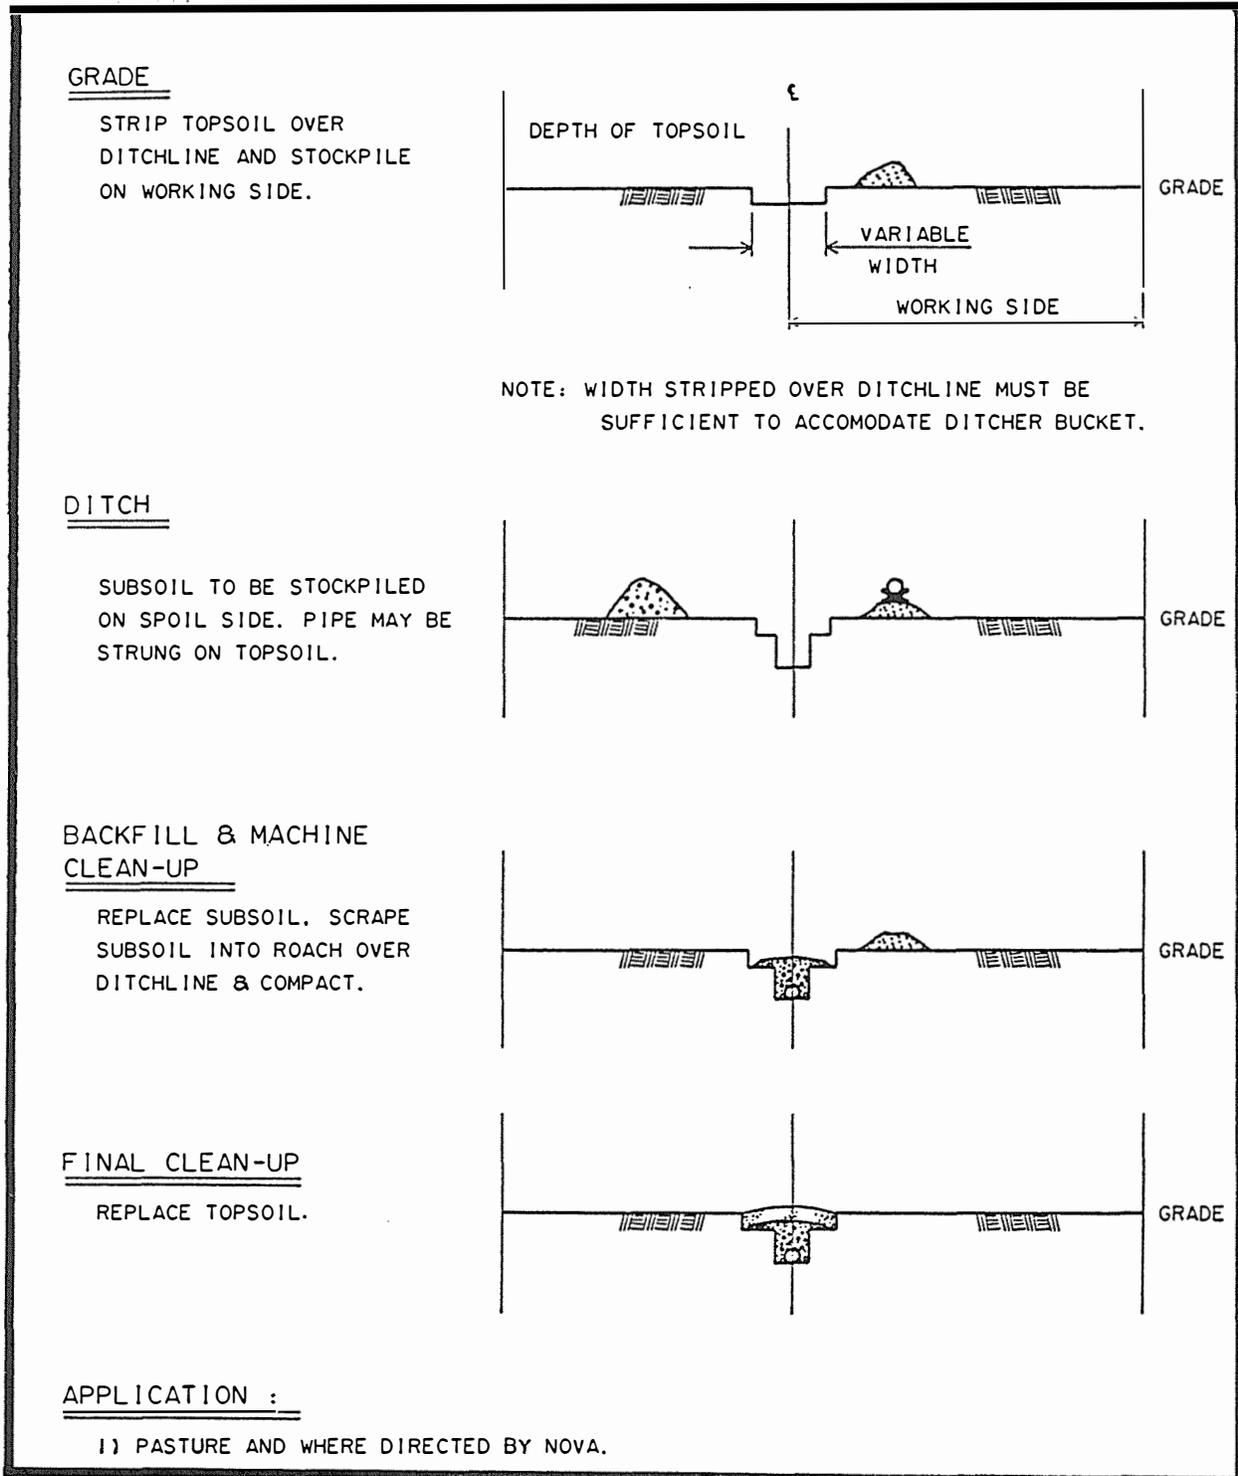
Topsoil Conservation using Blade Width Stripping during Summer Construction (NGTL 1990).
